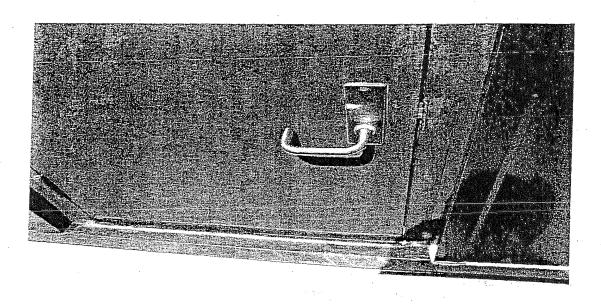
Cab Level, Exterior of Door by Outside Walkway. An excessive gap is shown on the latch side of the door that allows water to enter the building. The metal flashing also has a slight slope towards the door and threshold instead of towards the exterior.
